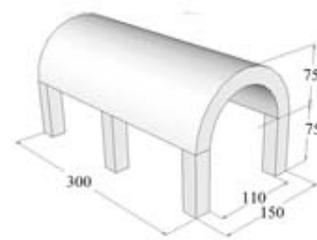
3-D model of circular canopy roof (All dimensions are in mm)
